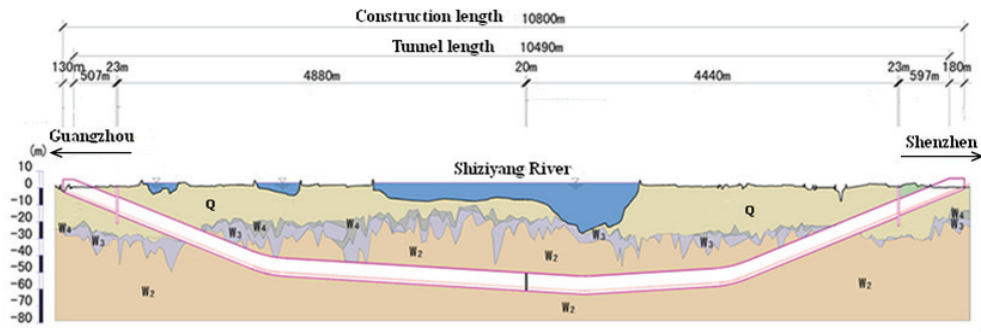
Longitudinal profile of Guangzhou Shiziyang Tunnel project
